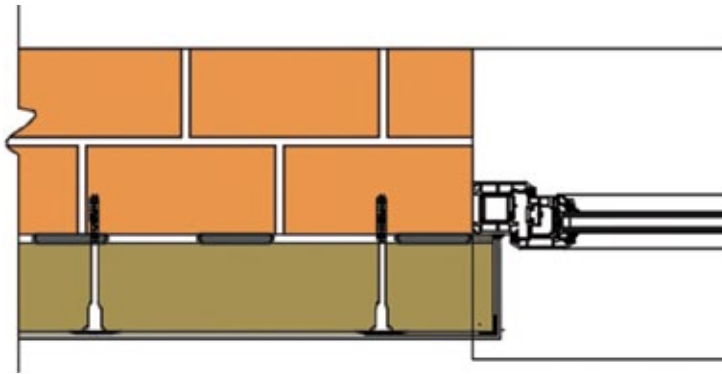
Reveal detail when window is set back from the face of the existing wall, where there is sufficient frame margin for the introduction of cold bridge insulation
